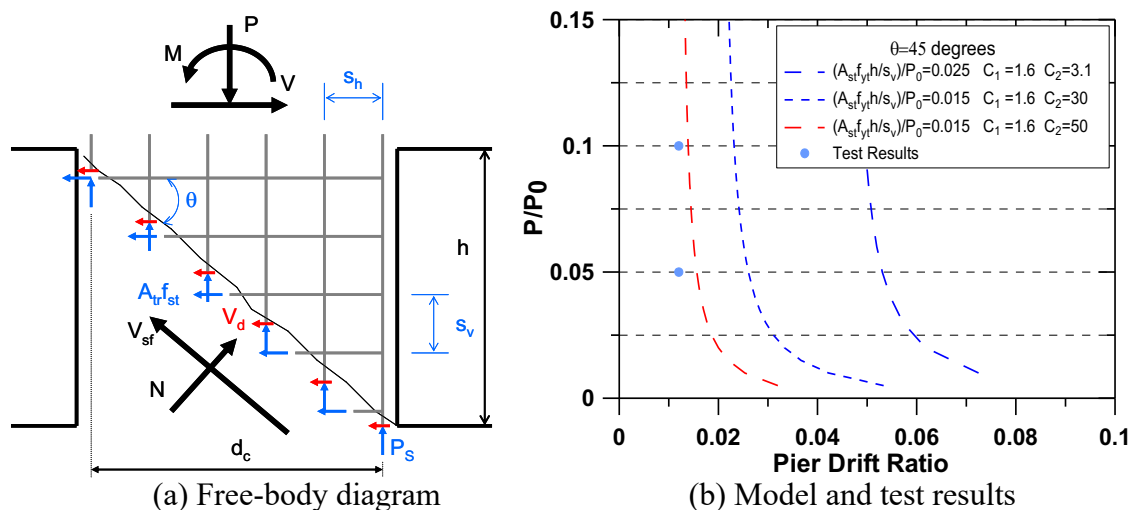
Axial load capacity model for a wall pier after diagonal cracking.
